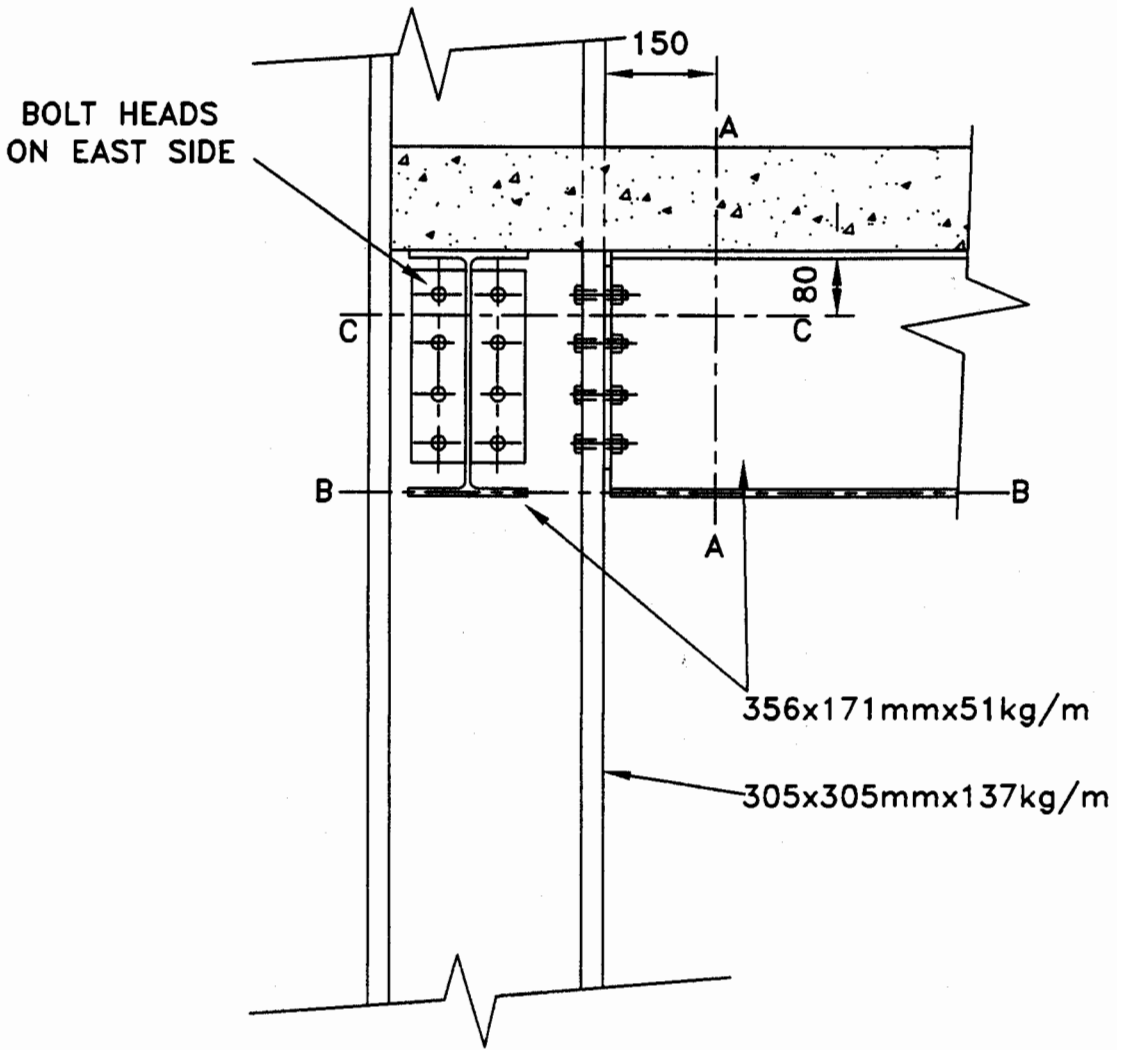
DETAIL AT FIN PLATE CONNECTION AT E-1/2
